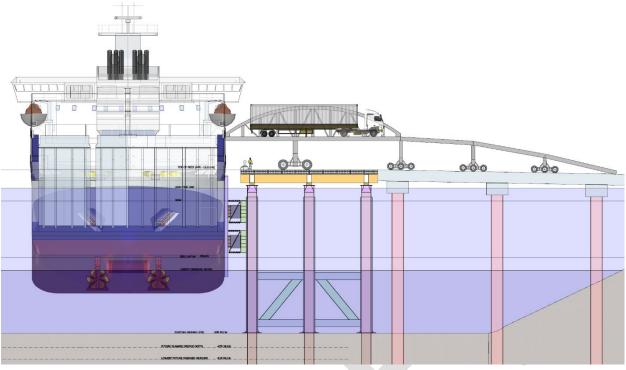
Terminal 2 - Cross Section with Jacket and Wharf Deck Topside Module and Trestle
